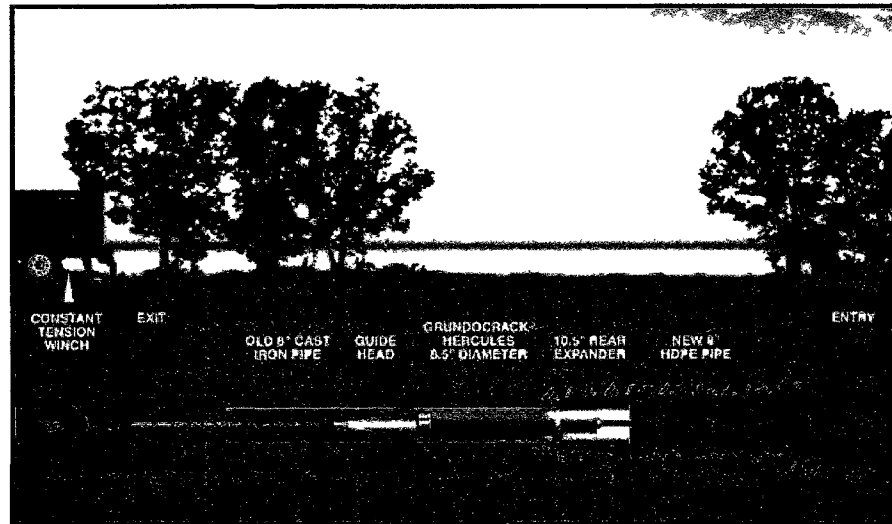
Trenchless Technology: Rehab Showcase, Spring 2002
